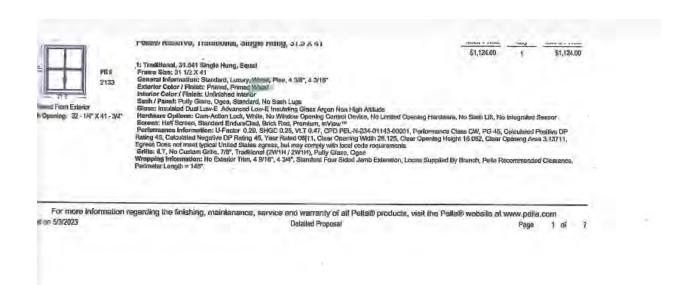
924 Carr St shorter window to be installed on rear elevation to accommodate sink
